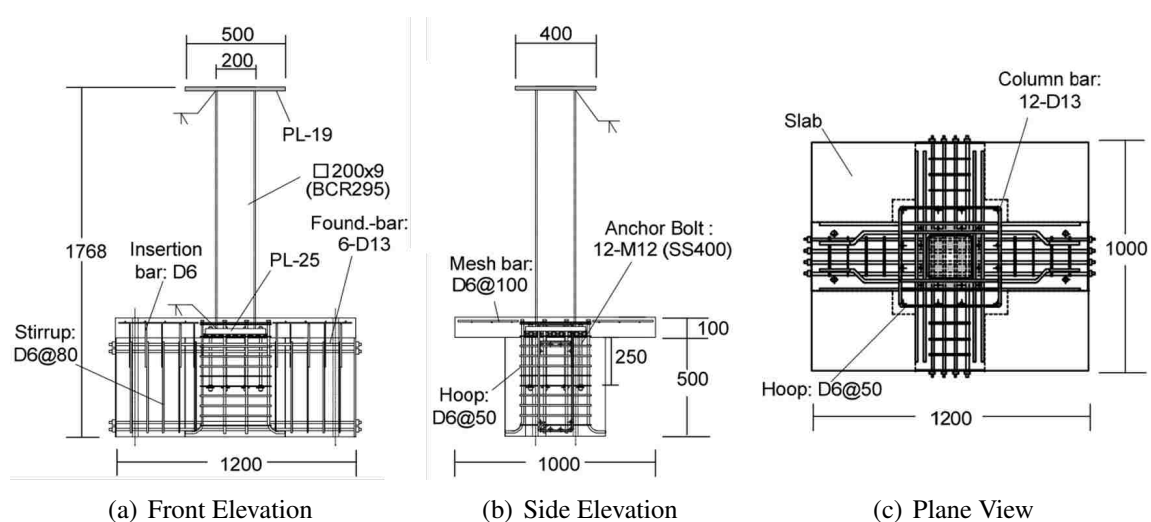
Sample Test Specimen, (Cui, et al; units in mm)
